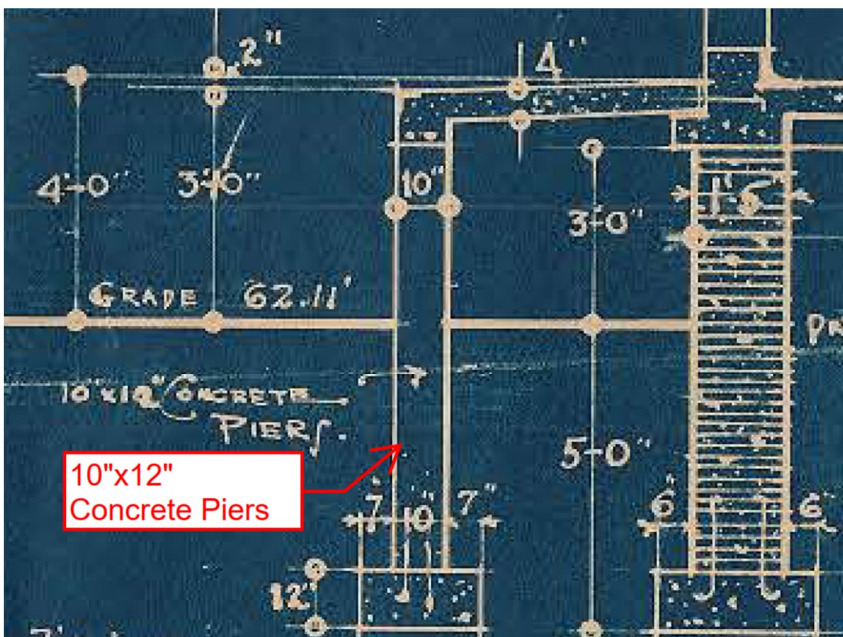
Section View of West Shipping Platform Piers on 1936 Drawings
